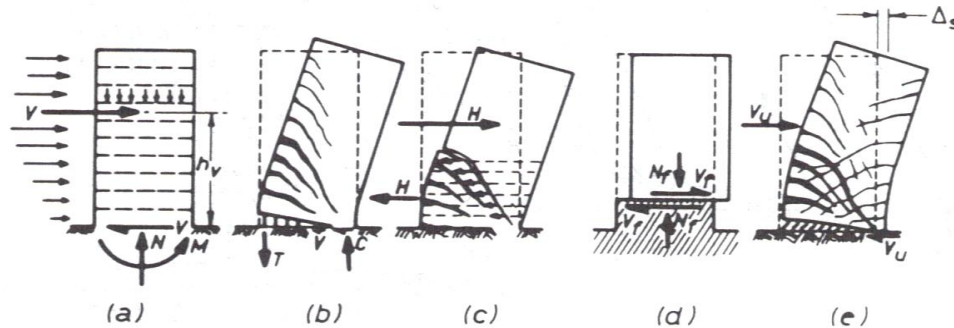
Typical cantilever shear wall failure modes. (b) Rocking failure (c) Shear failure (d) Sliding failure (e) Flexural failure (Paulay and Priestley, 1992)
